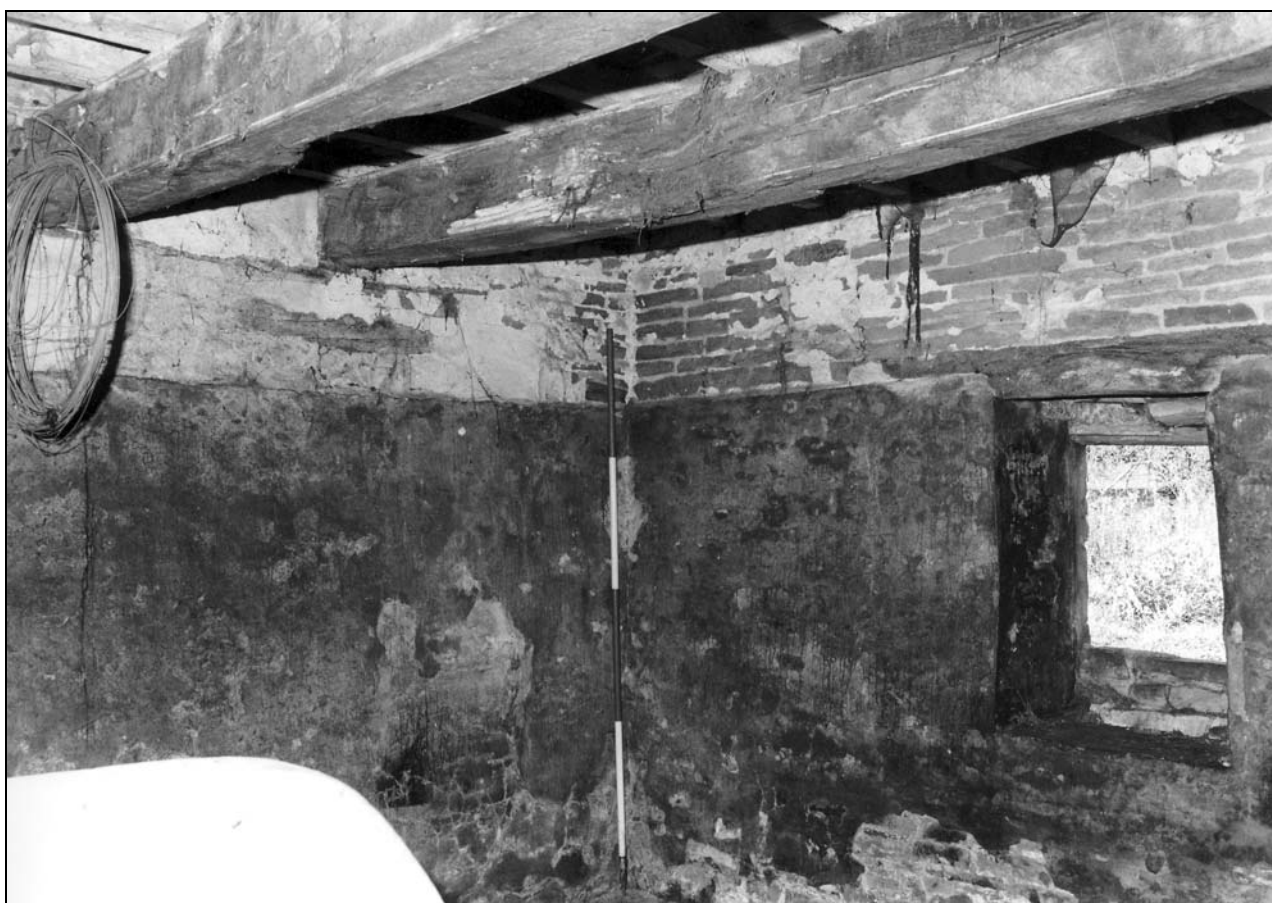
Building 2: ground floor, from the south-east (film 2, frame 18)
